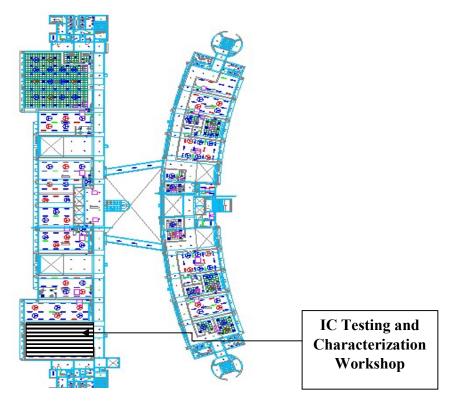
Floor Plan View of IC Testing and Characterization Workshop
